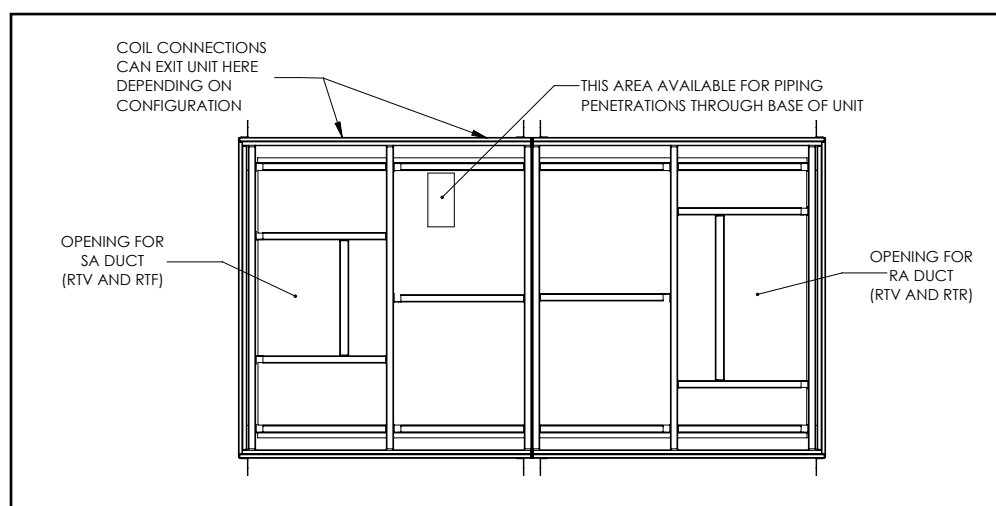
PIPING PENETRATIONS DRAWING B
